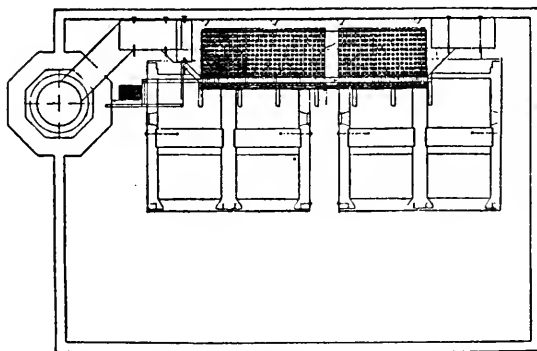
LAYOUT OF TYPICAL BOILER PLANT SHOWING INSTALLATION OF ECONOMIZER ABOVE BOILER SETTINGS
